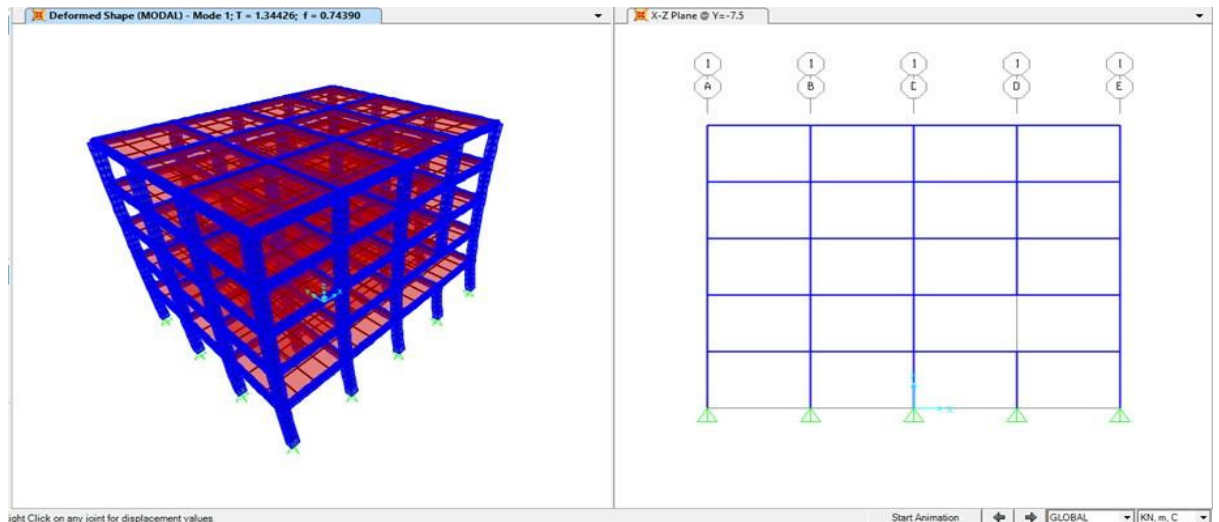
Deformed Shape (MODAL); Mode 1 (FC at 1st floor)
